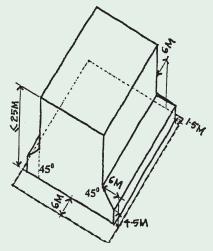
A Building Envelope for Multi-Residential <25m high & <150m² Non Residential Component
